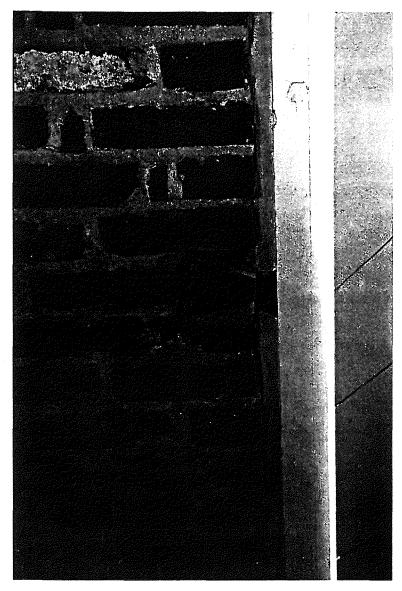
John Brown's Fort , interior elevation of jamb at center bay doors. Note wood nailing block pulling away from masonry.
